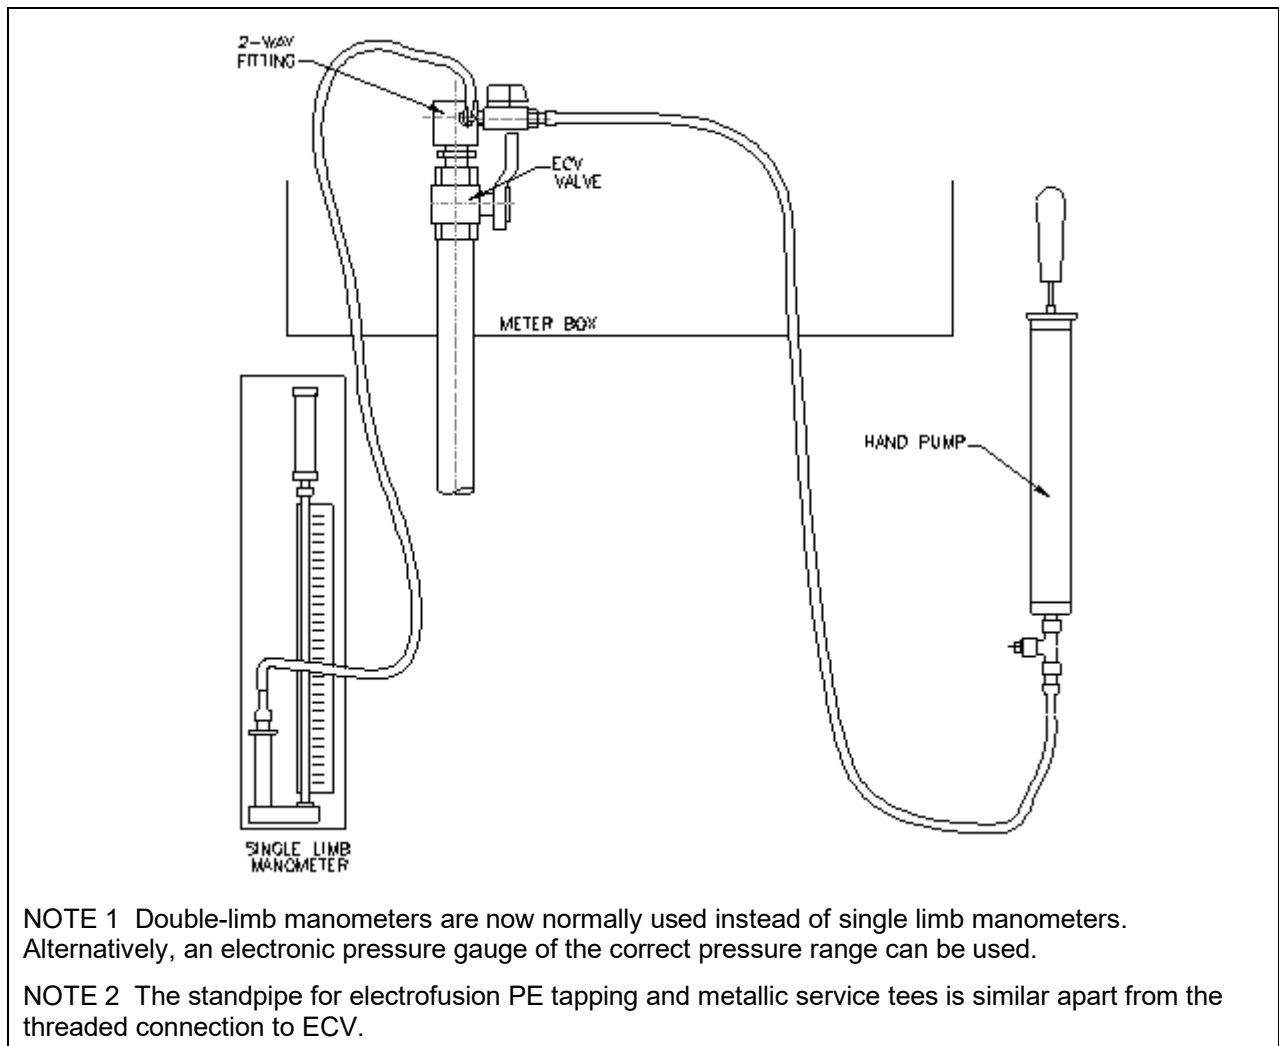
Typical test assembly for steel or polyethylene services from the house end using an emergency control valve
